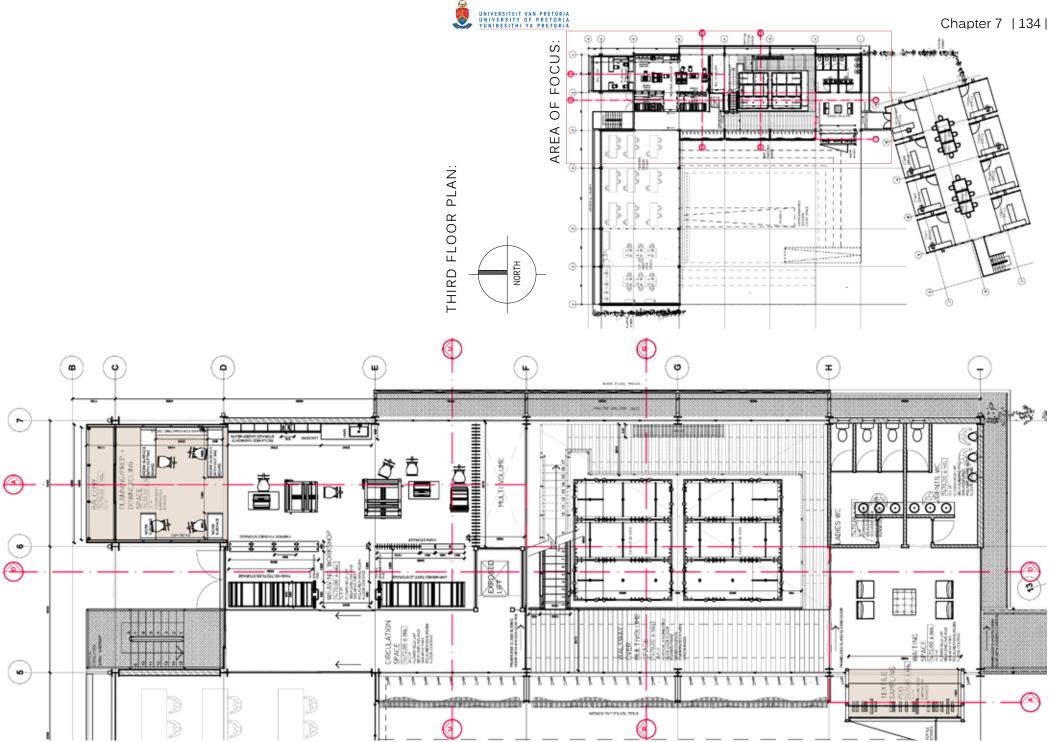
Third floor plan. Not to scale. (Author, 2012)
